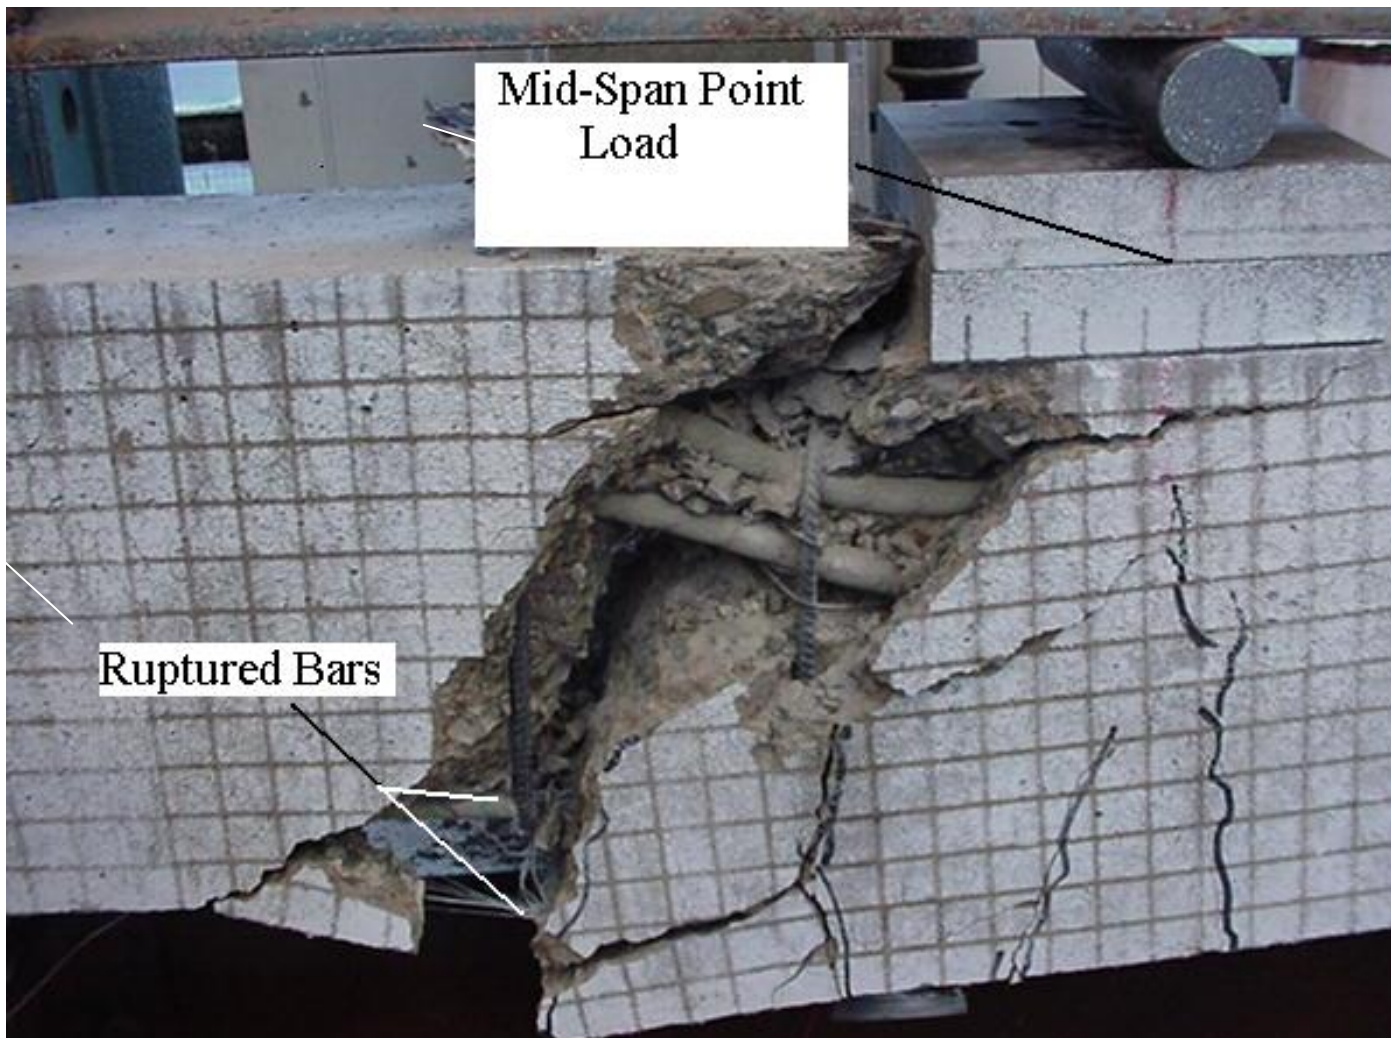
GFRP bar rupture at bottom layer of beam GcOU
